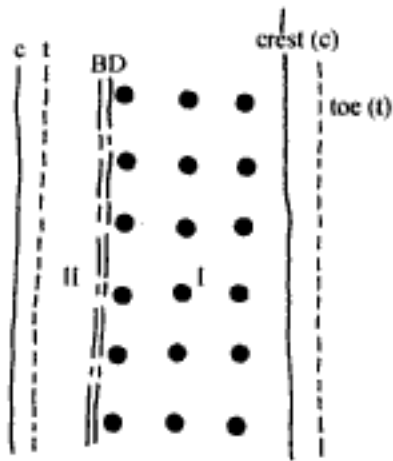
Plan view showing ideal blast damage zone (BD).
